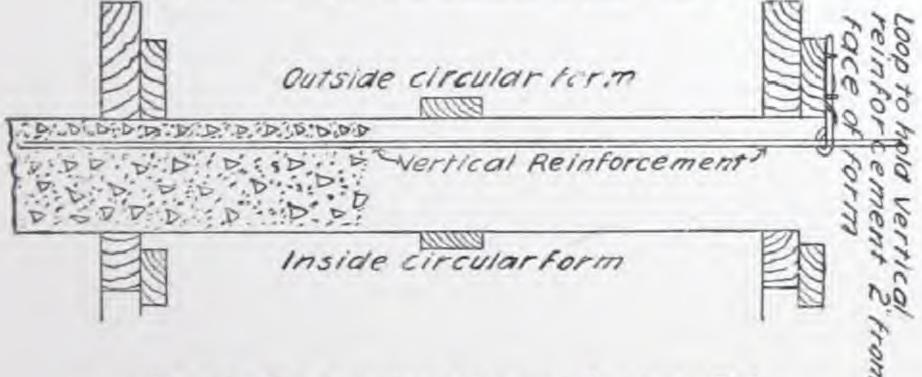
Plan for holding in place vertical reinforcing Rods.
